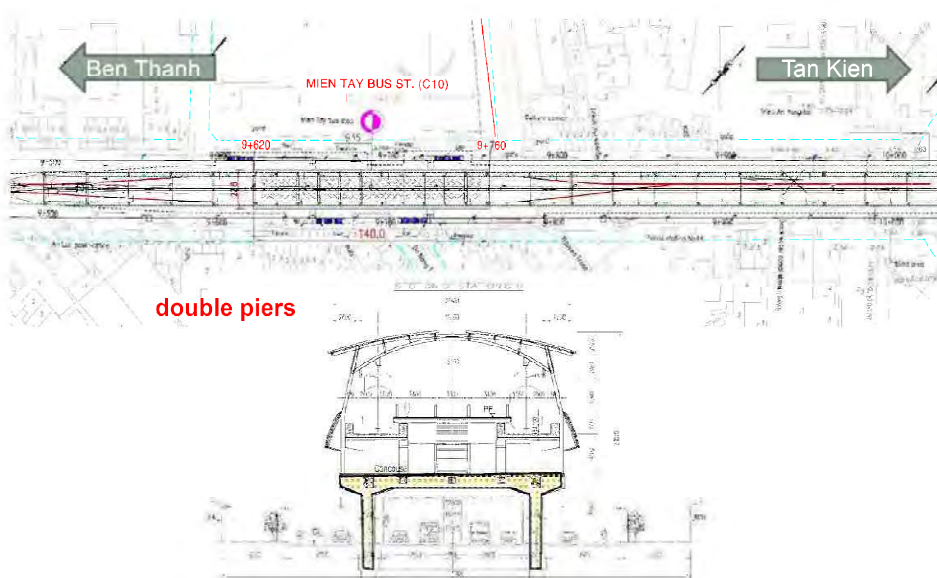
Plan and Profile at C10 Proposed by the JST
